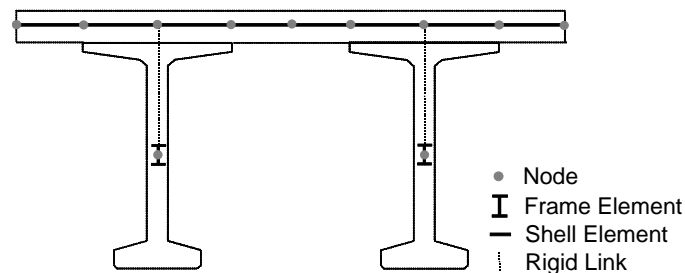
Finite-element modeling scheme of the I-40 Bridge.
